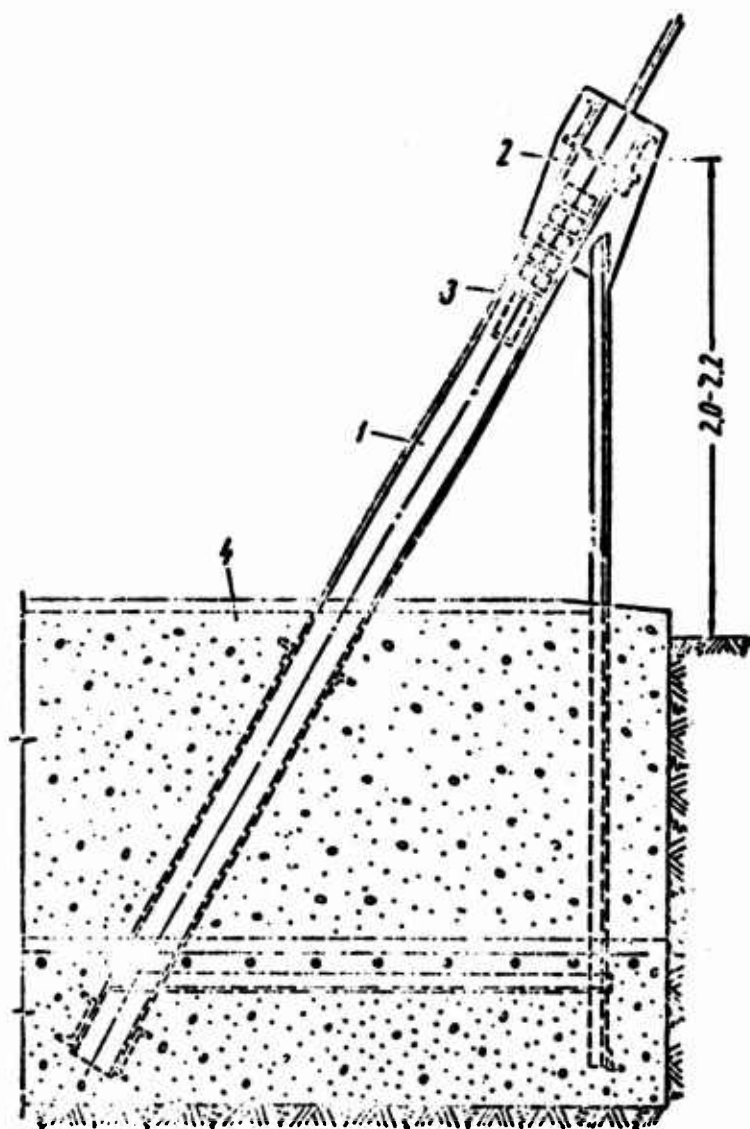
The fastening of the stretching cable at a height of 2 m: 1 - metallic design; 2 - stop; 3 - parts of the fastening of the stretching cable; 4 - foundation.
